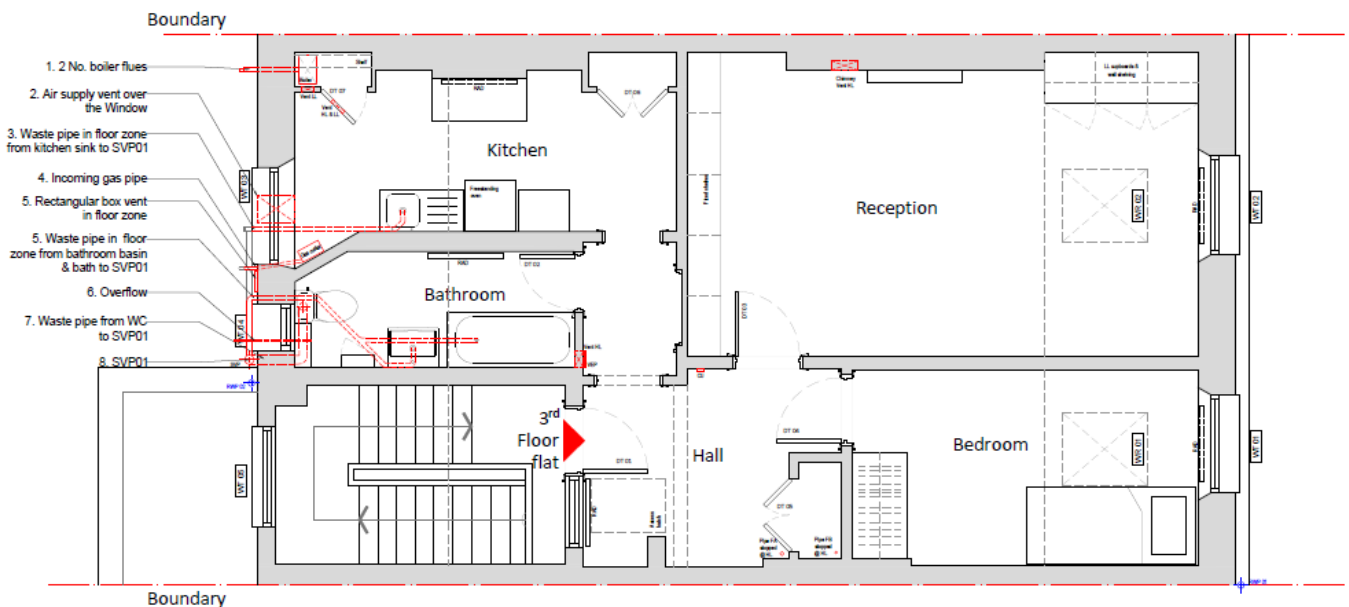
Extract from drawing 8388/ 05 Existing Plan
